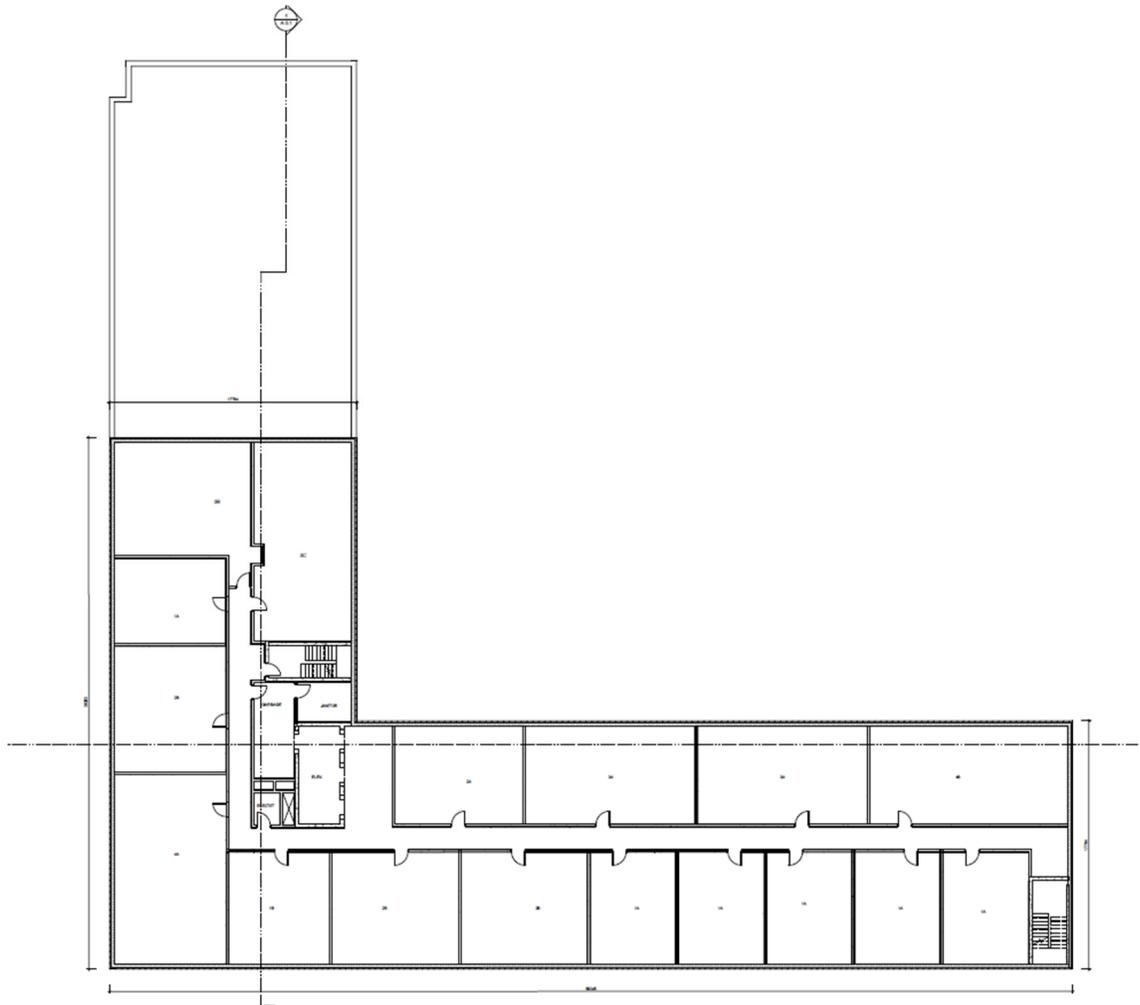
6th and 7th Storey Floor Plan prepared by IBI Group
